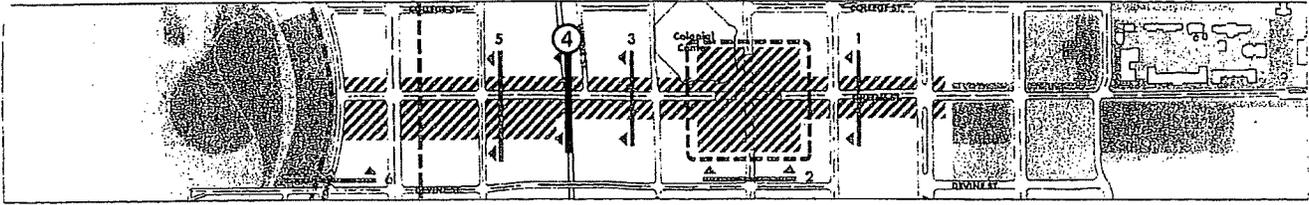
SECTION 4: GREENE STREET BRIDGE OVER THE RAILROAD TRACKS
